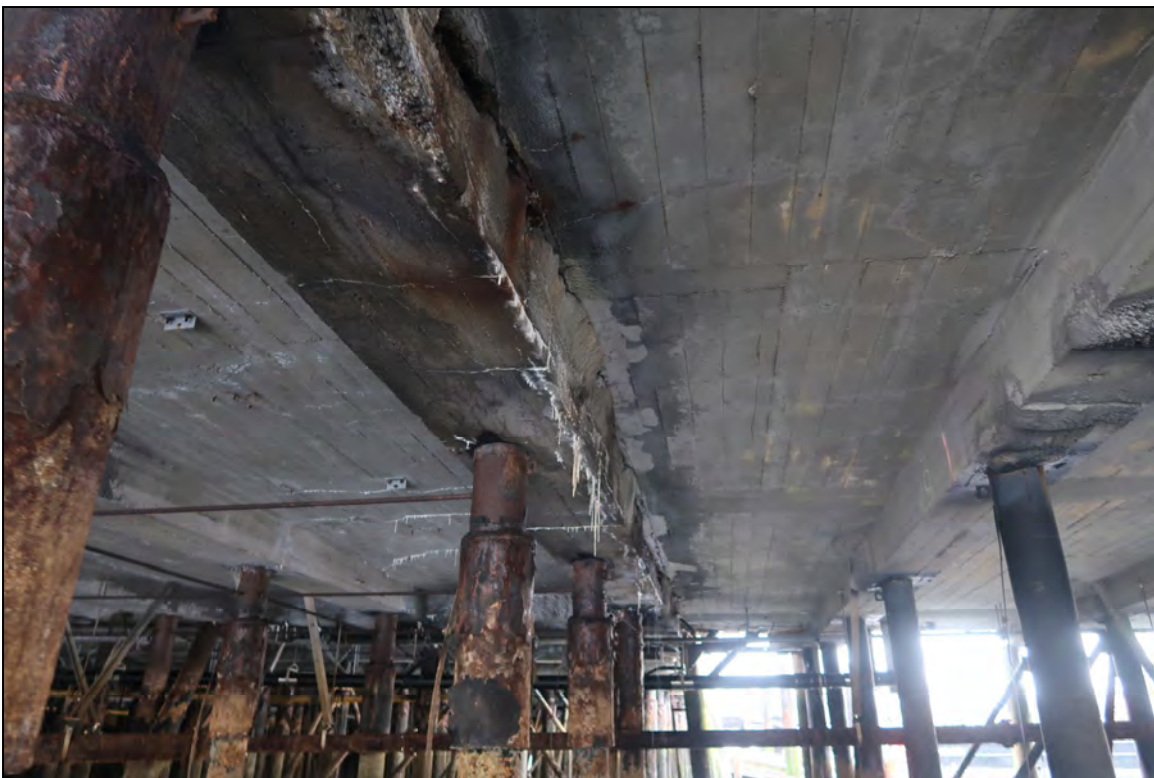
Spalling and efflorescence along the pile cap beneath Wharf 3.
